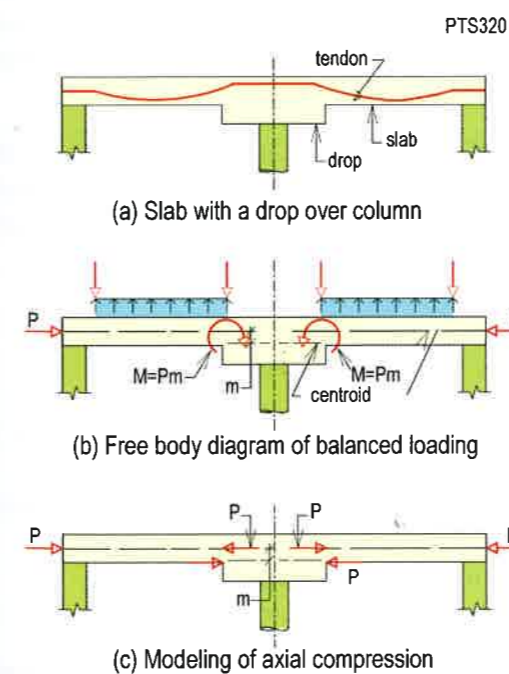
C-2 Balanced Loading at Drop Cap/Panel
